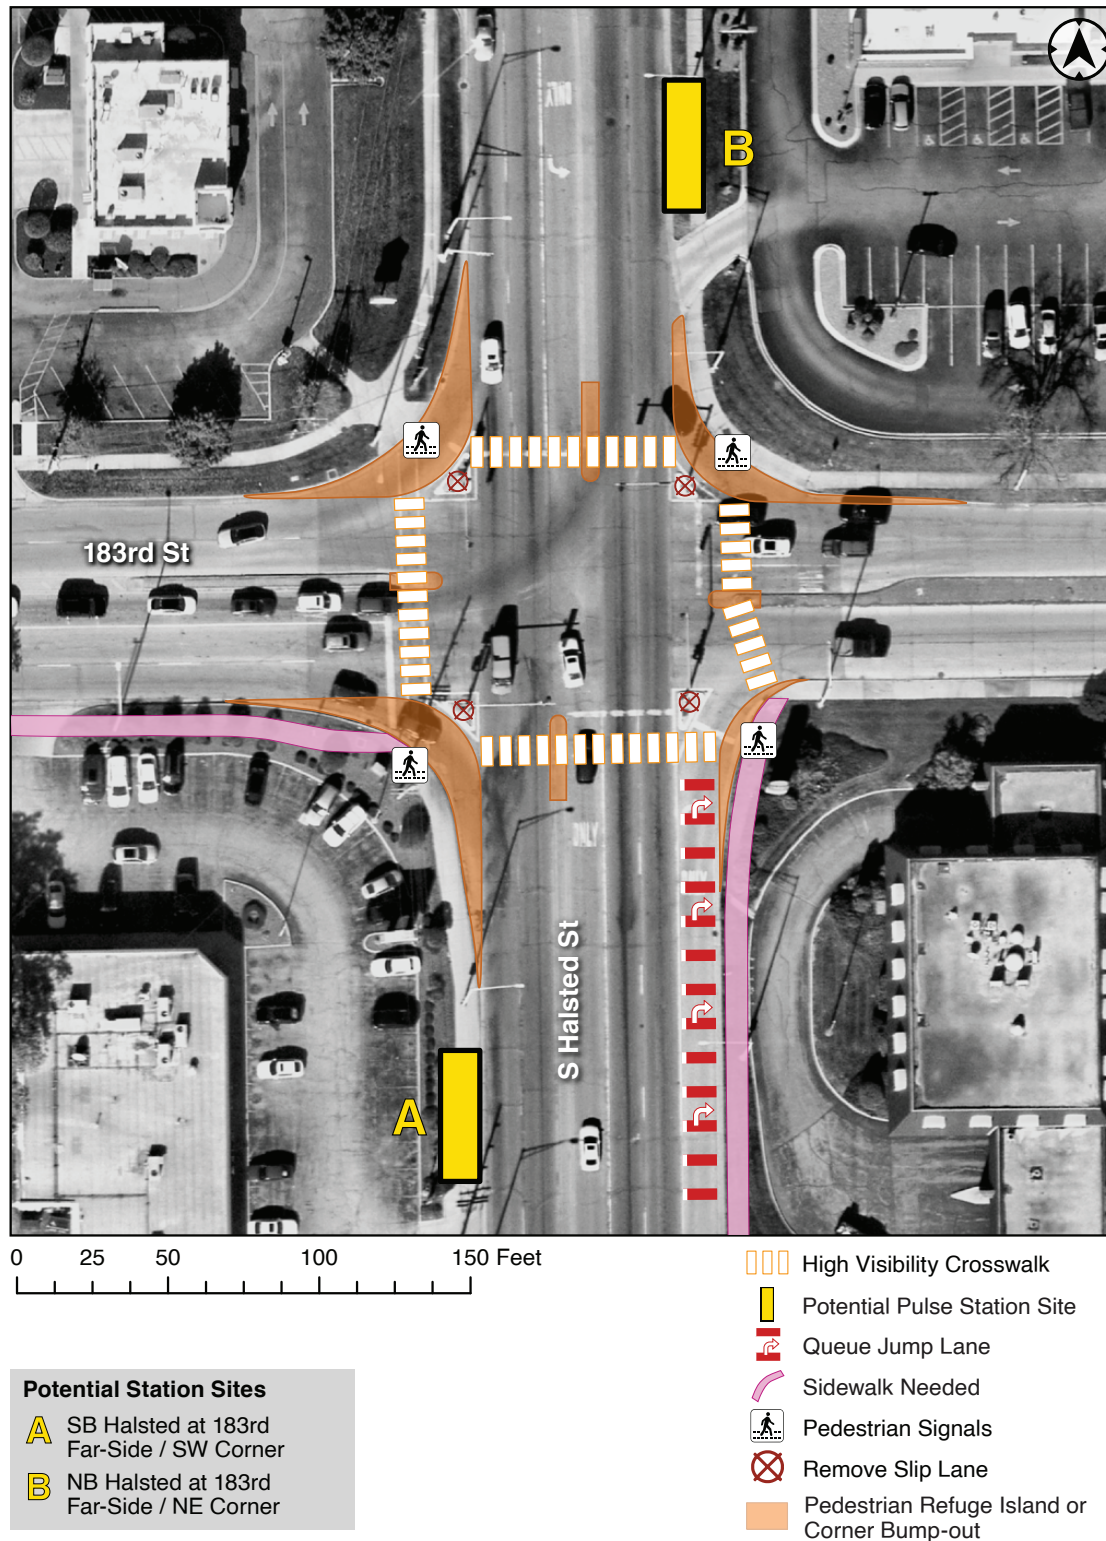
South Halsted Street and 183rd Street Station Area Conceptual Intersection Design
